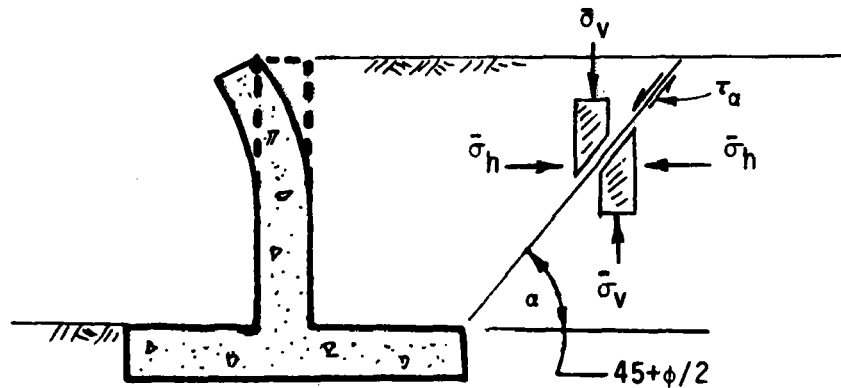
SHEAR PLANE DEVELOPMENT BEHIND A WALL YIELDING
